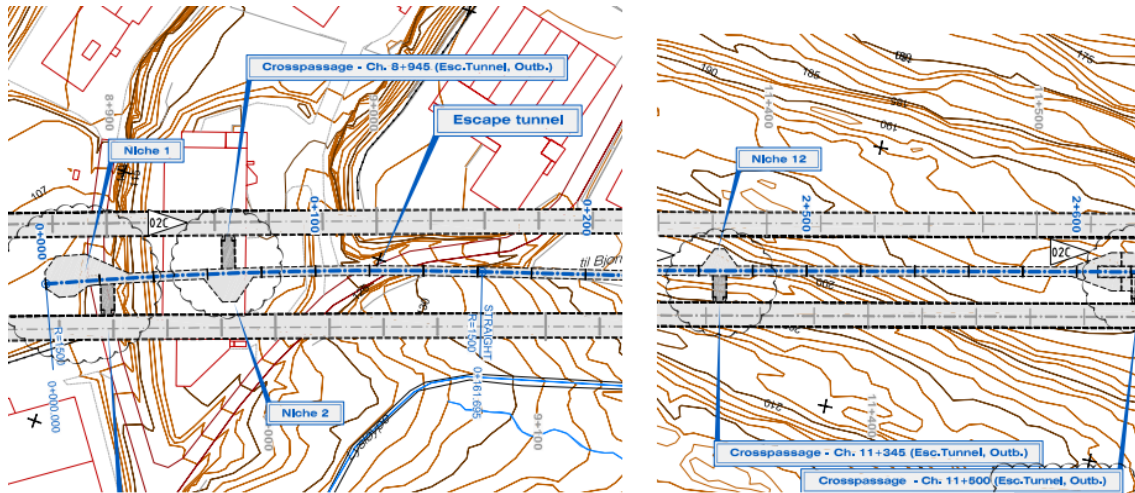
Escape tunnel alignment parallel to the TBM tunnels towards North. (Just the beginning and end are shown).
